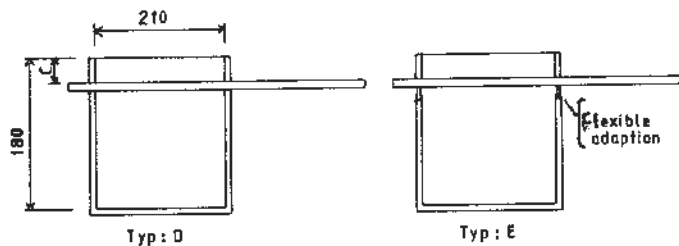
Pull-out specimen. The diameter of the cylindrical specimen is 210 mm.
